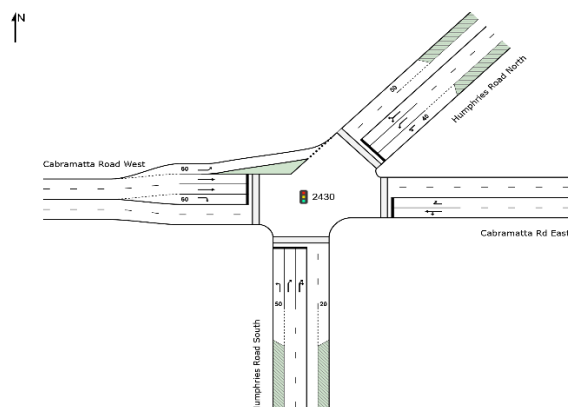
Cabramatta Road/ Humphries Road – Proposed Layout
